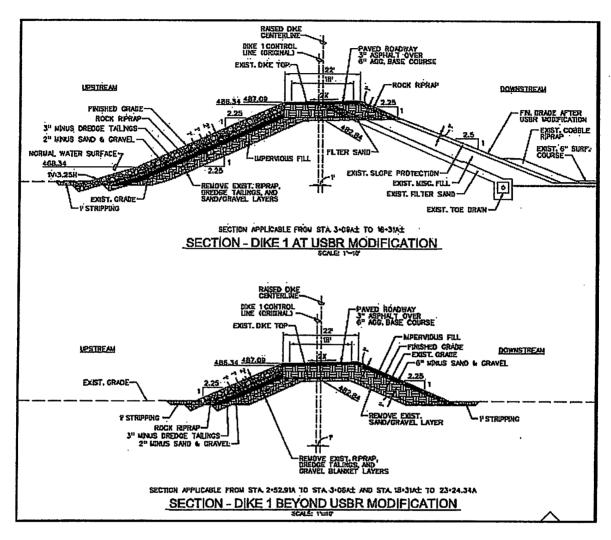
Preliminary typical cross section for 3.5-foot raise at Dike 1.
